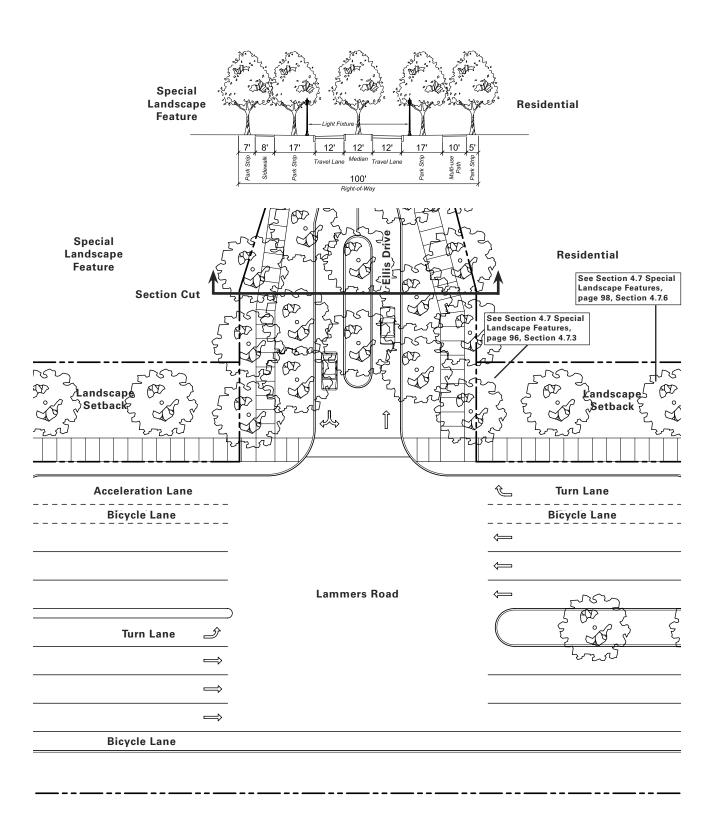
Build-out Section and Plan: Regional Arterial – Lammers Road, Designation A (Final Build-out)
